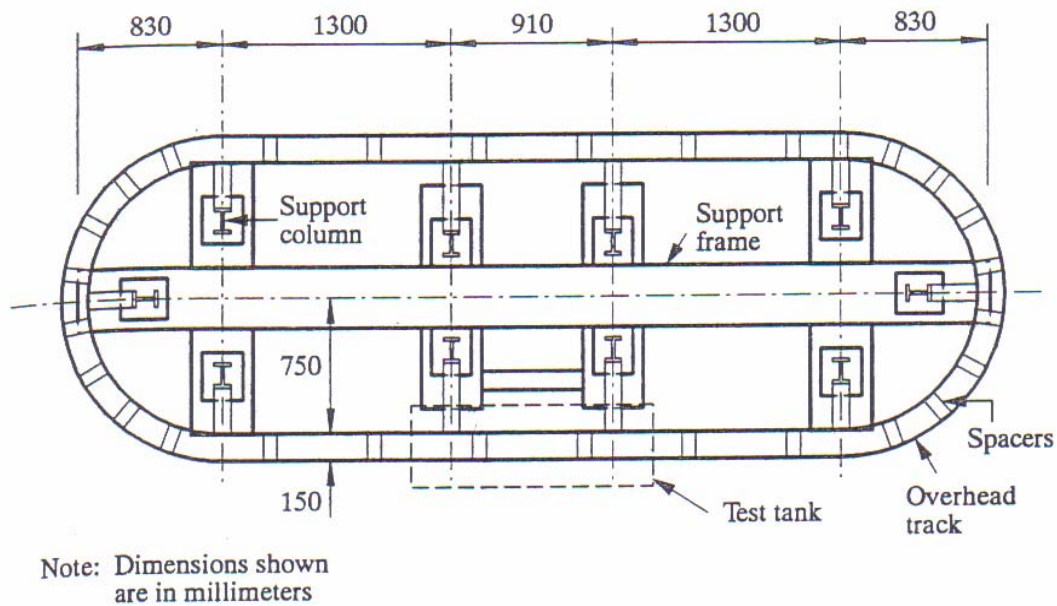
Plan of Test Track at Sydney Pavement Testing Facility [26]
